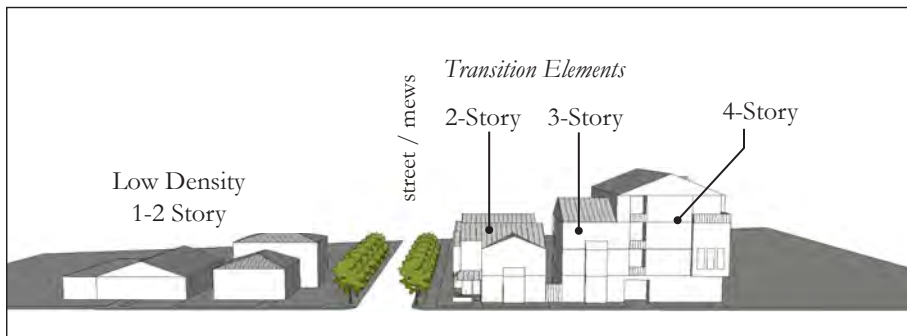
Transitions can also be made by stepping massing down within a project, with lower building elements providing a buffer between taller elements and adjacent lower-density development.
